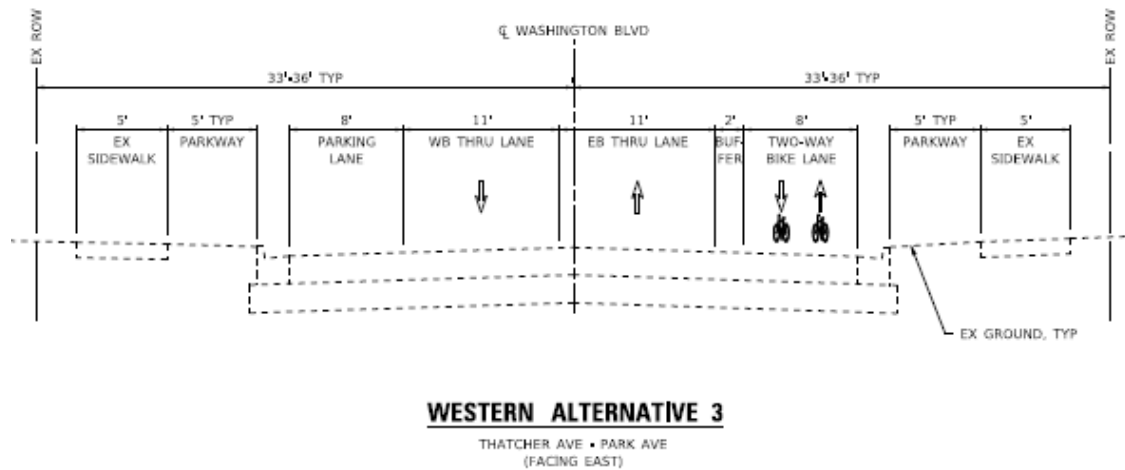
Western Typical Section Alternative 3 Washington Blvd.
